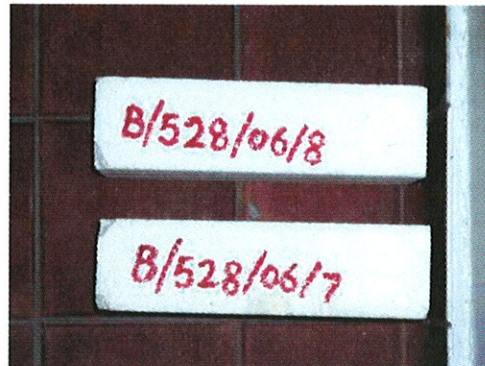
JM Insulating Firebricks - Cremators Room and Storage Room
